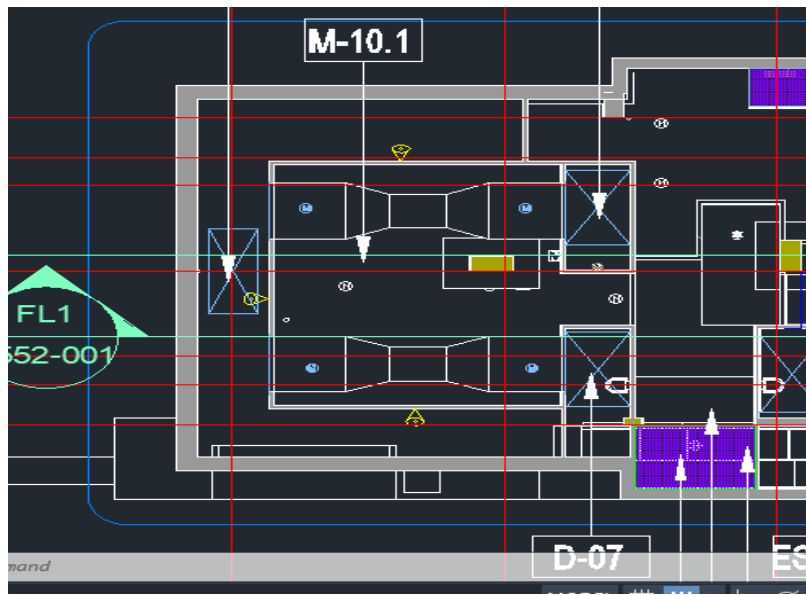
AutoCAD layout (Floor Plan) of Tunnel Ventilation Fan Room (M-10.1)
